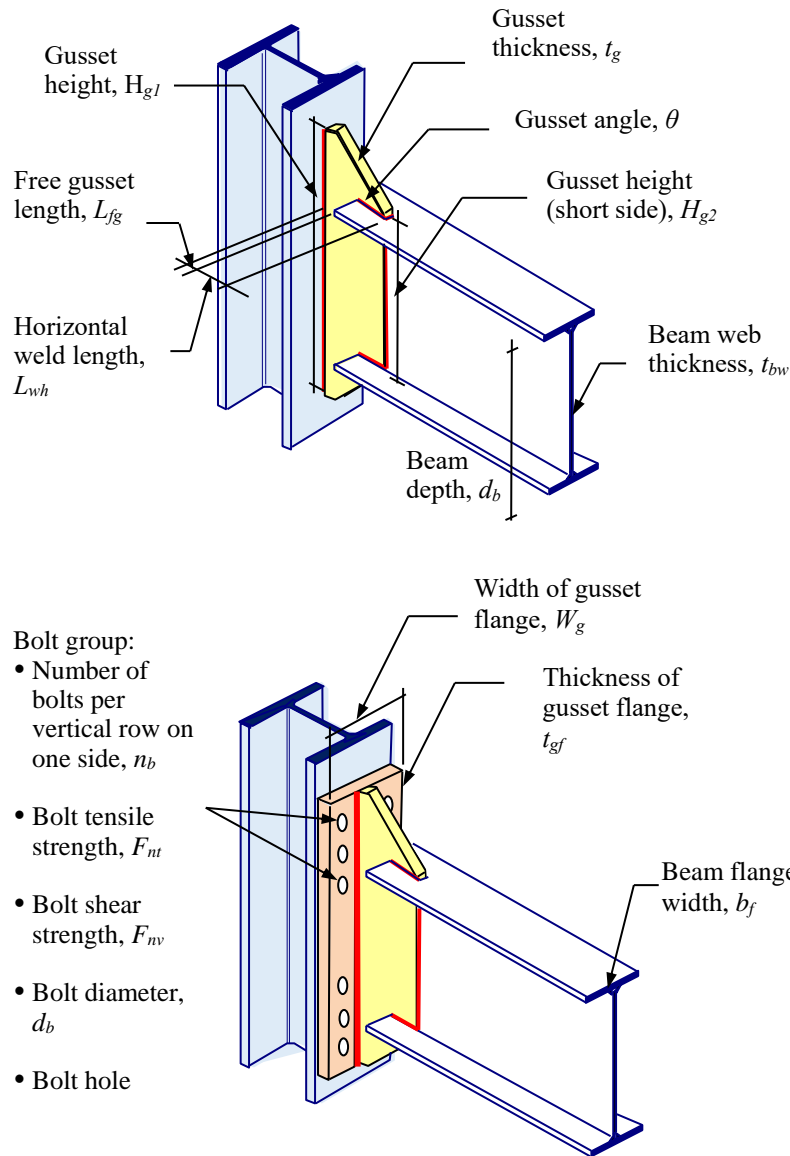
Main design parameters for the welded and bolted GPMC
